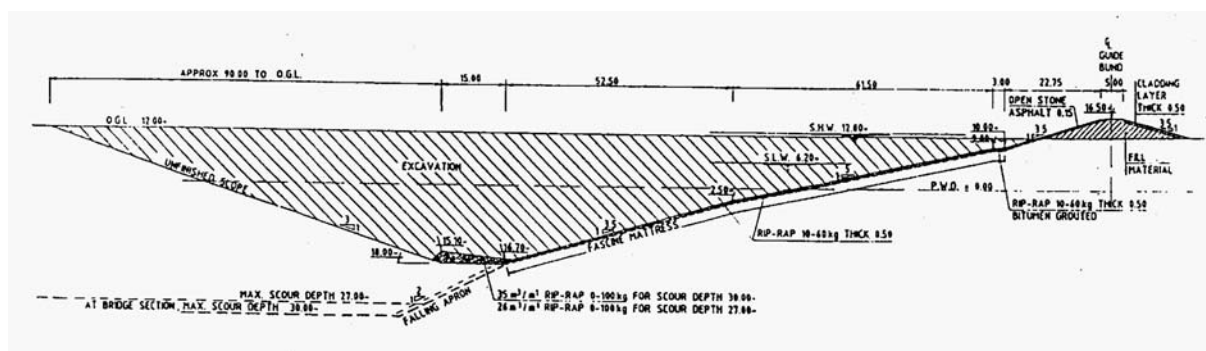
(c) Jamuna Bridge: Typical Cross Section of Guide Bund
